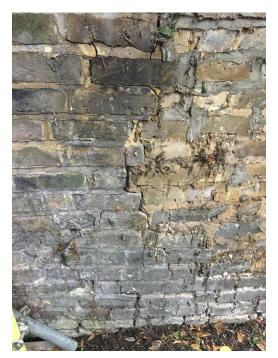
Illustrating cracked and bulging wall adjacent to T7.
